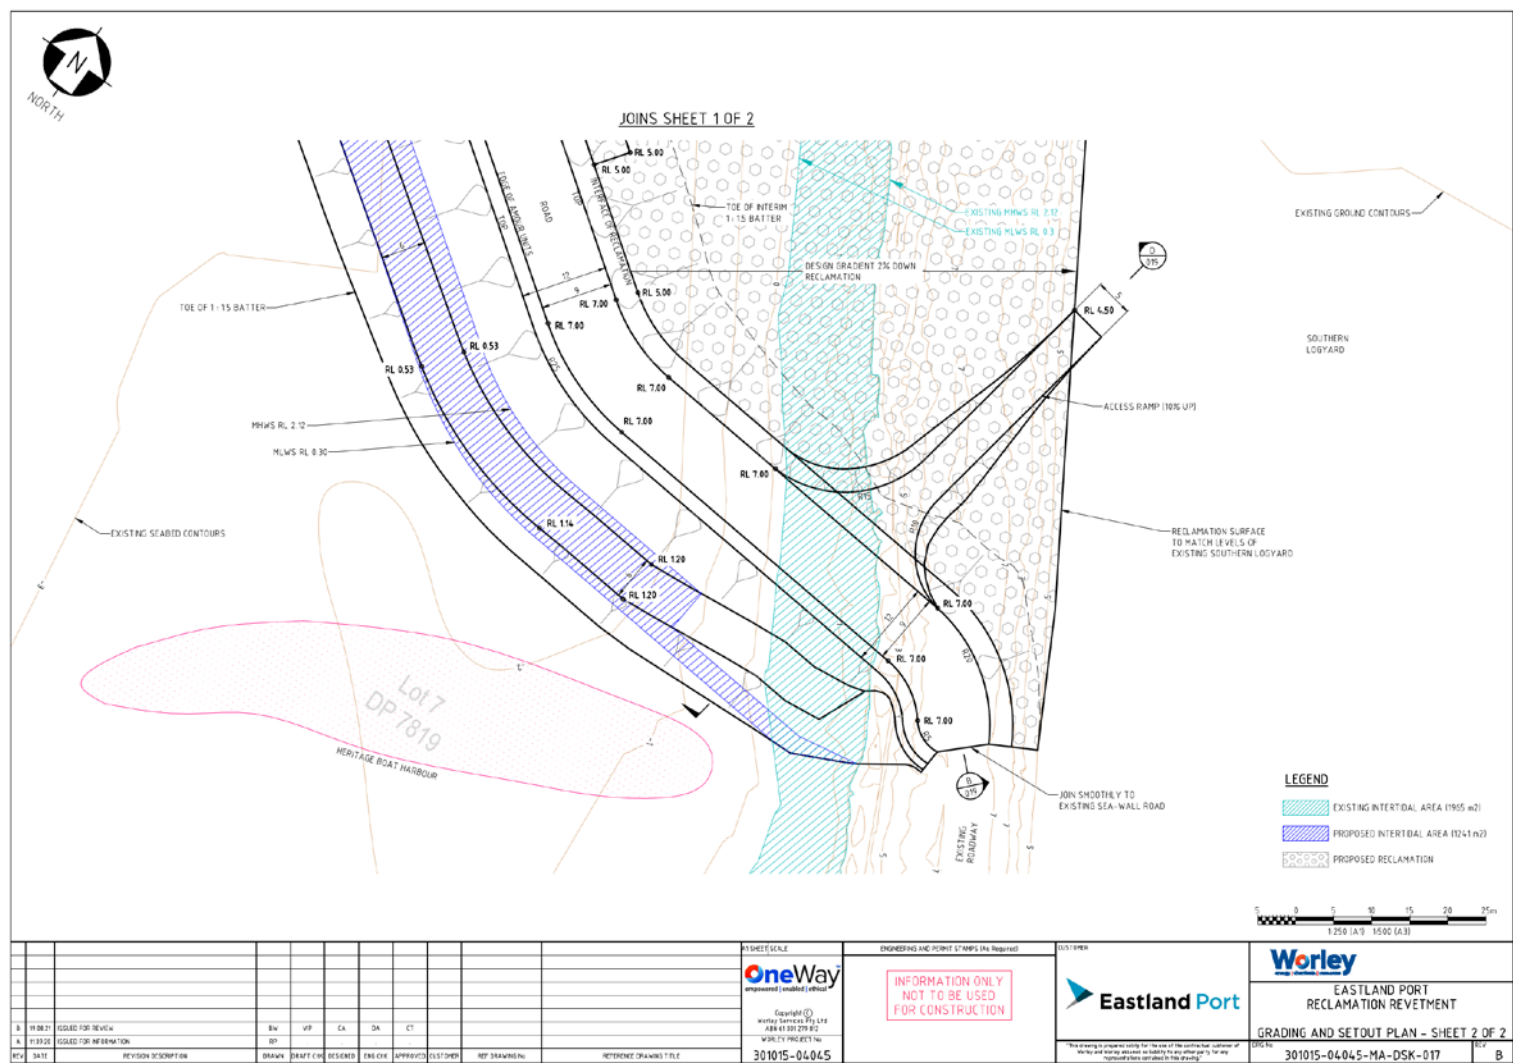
Eastland Port Reclamation Revetment Grading and Setout Plan (Sheet 2)
